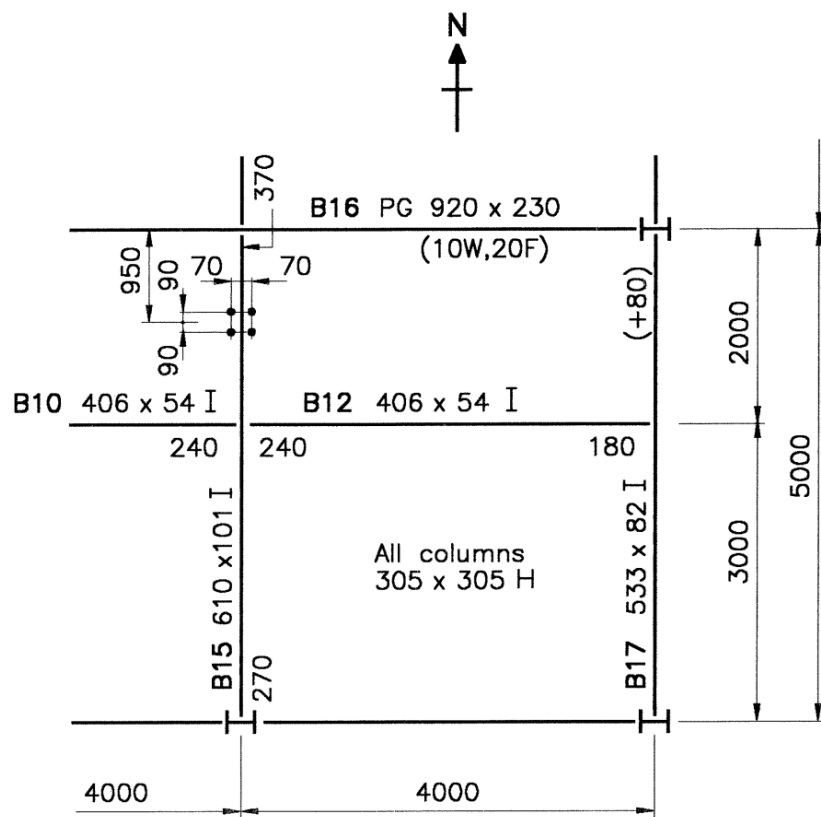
represents part of an engineer's floor layout drawing and shows how all the information needed to detail the beams is provided in a way that is both concise and clear.
